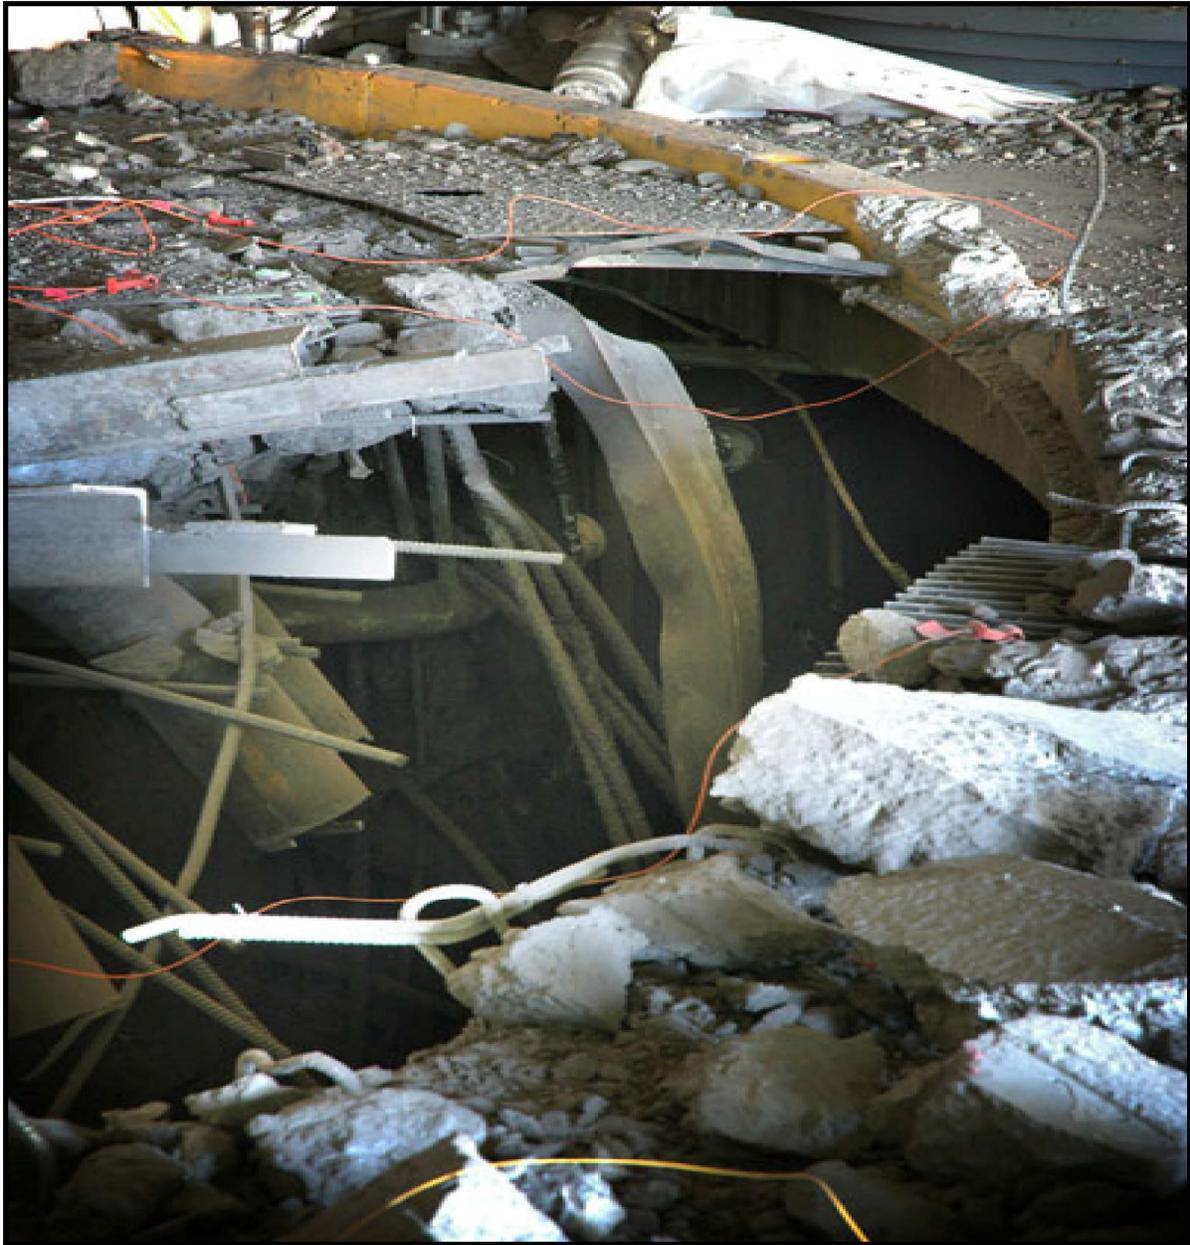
Result of explosive fracturing of the Engineering Test Reactor bioshield.
